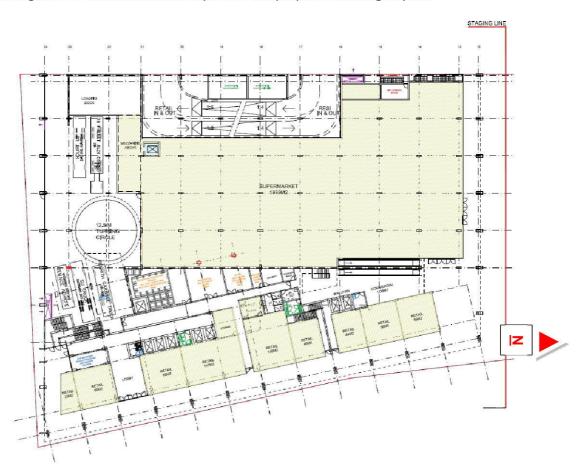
Proposed Lot 3003 Architectural Layout (Courtesy of Crone Architecture)
